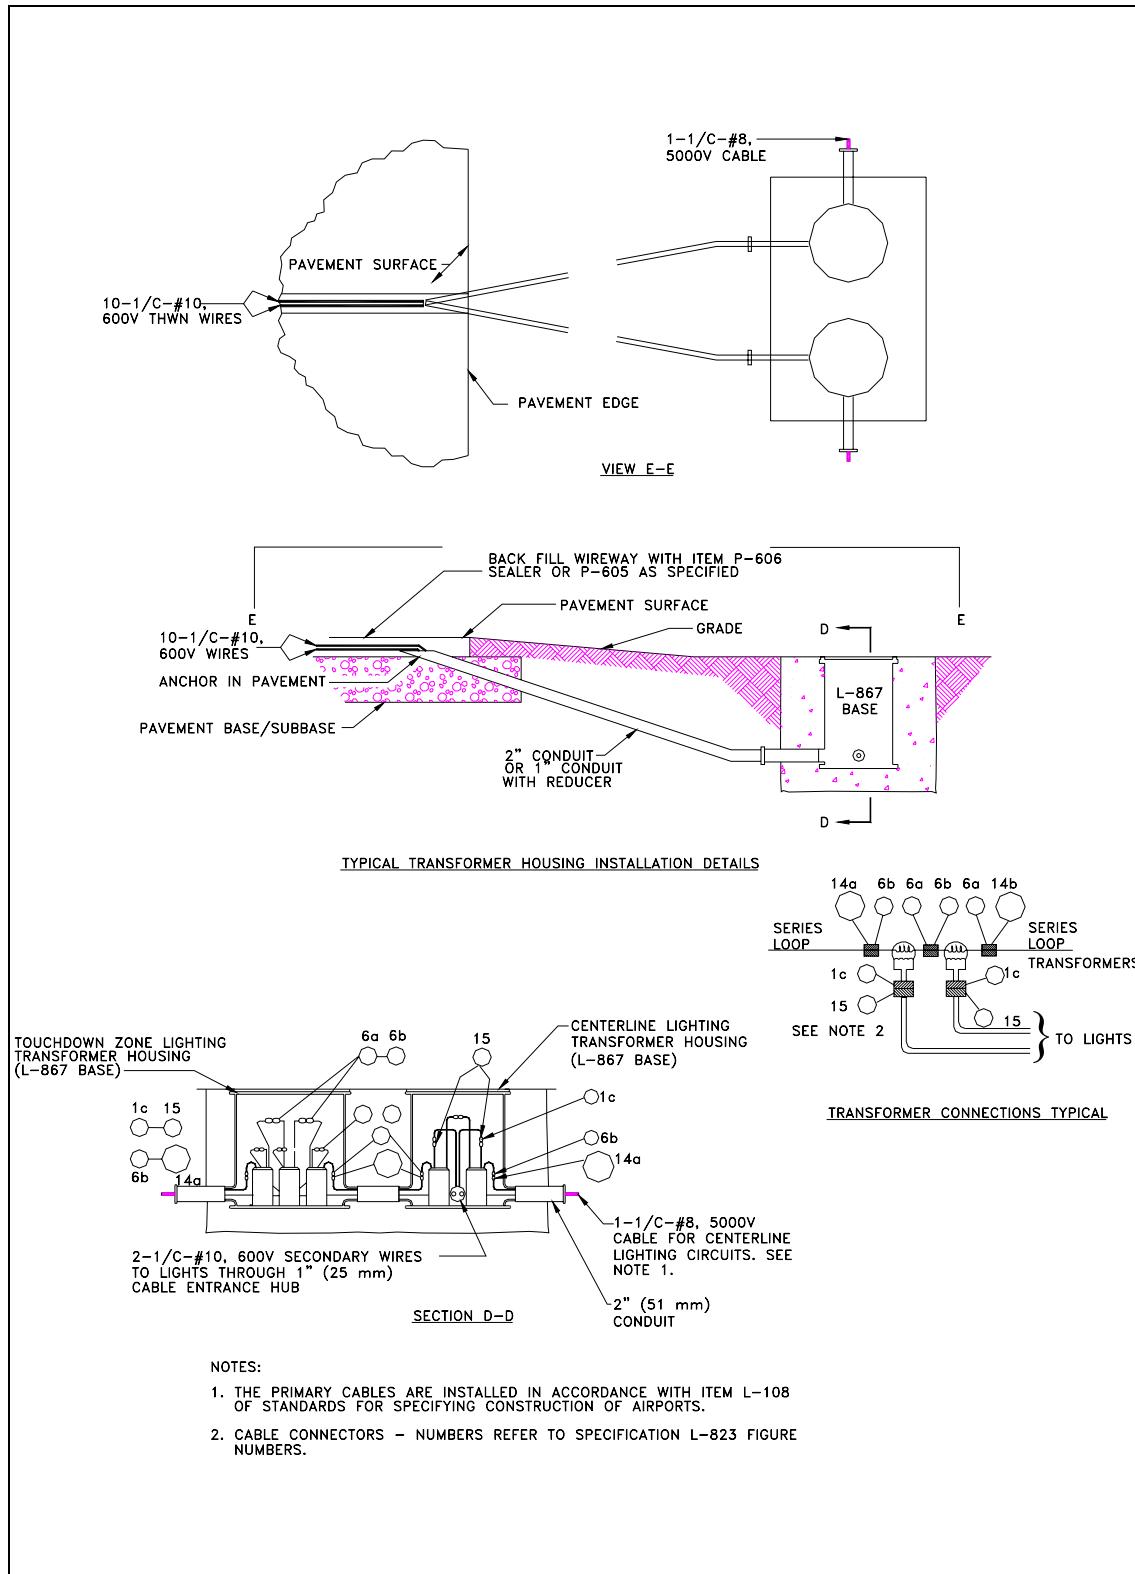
Transformer Housing Installation Details Inset Type Lighting Fixtures
